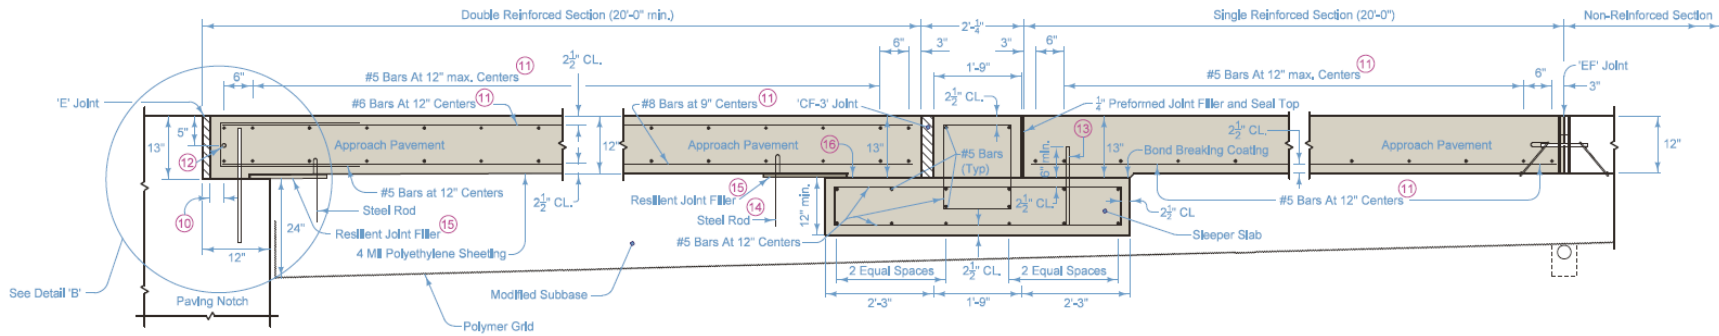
1215 Polk Approach Slab Section (Iowa DOT)
